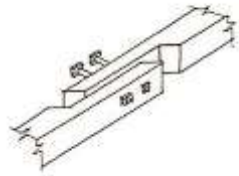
Connecting 2 Vanku with bolts through lap joint
